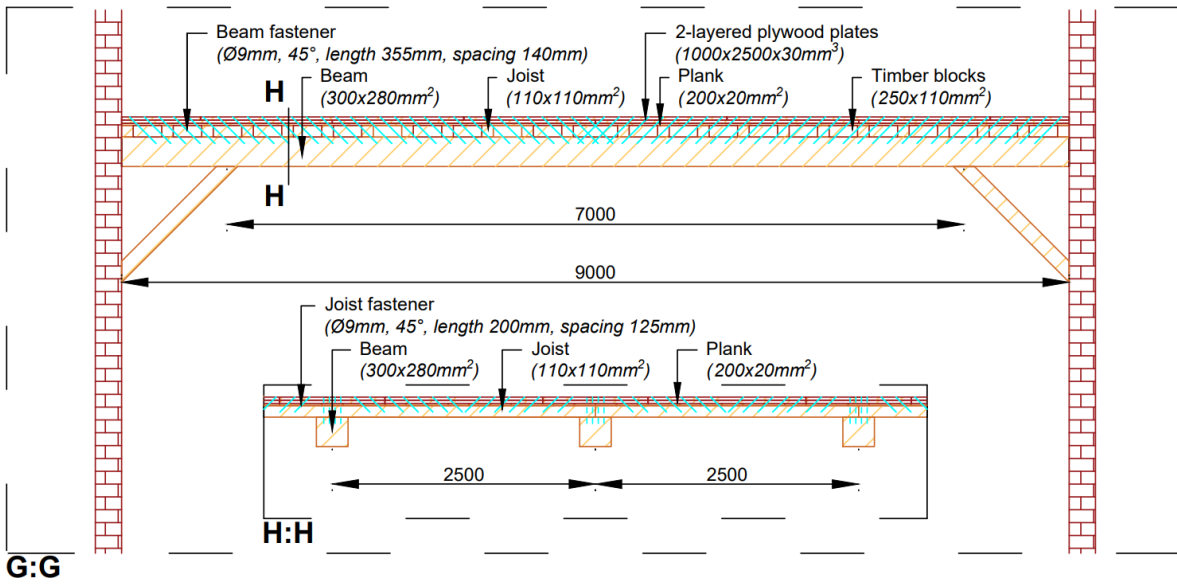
Side view of the attic floor after strengthening the joist direction
